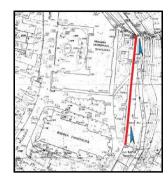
The fortress wall -Section 1, Plan and image, 2007
